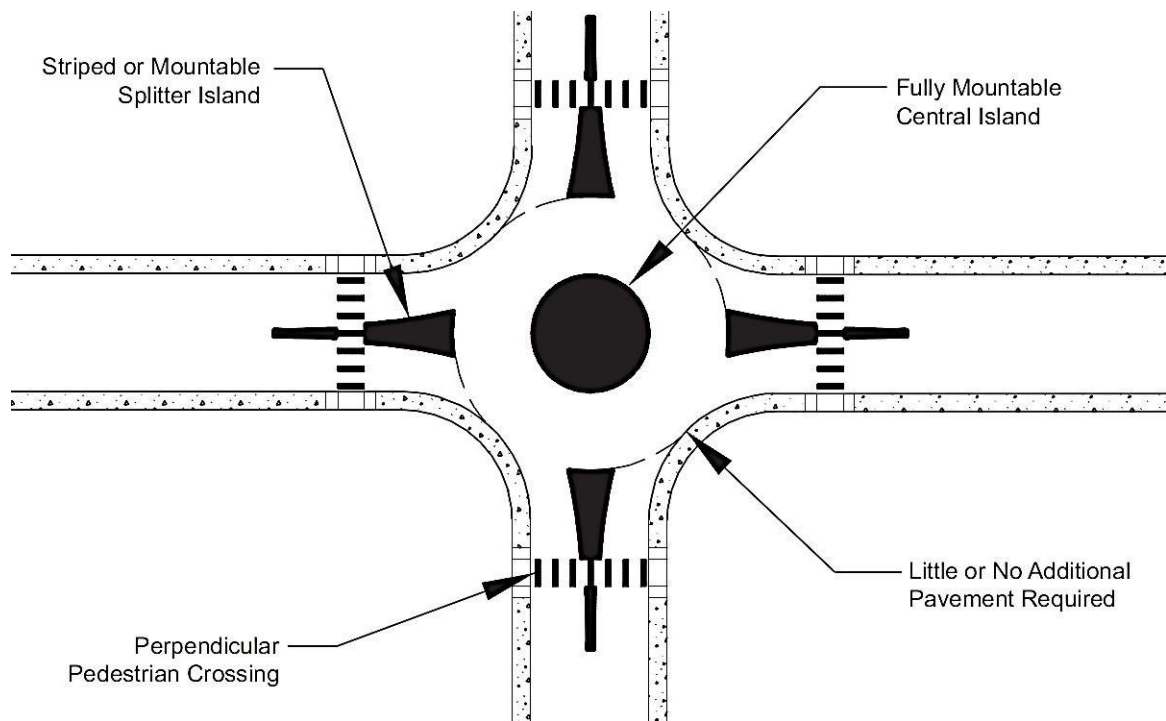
/4: Typical Mini-Roundabout, [1, p. 9-23]
